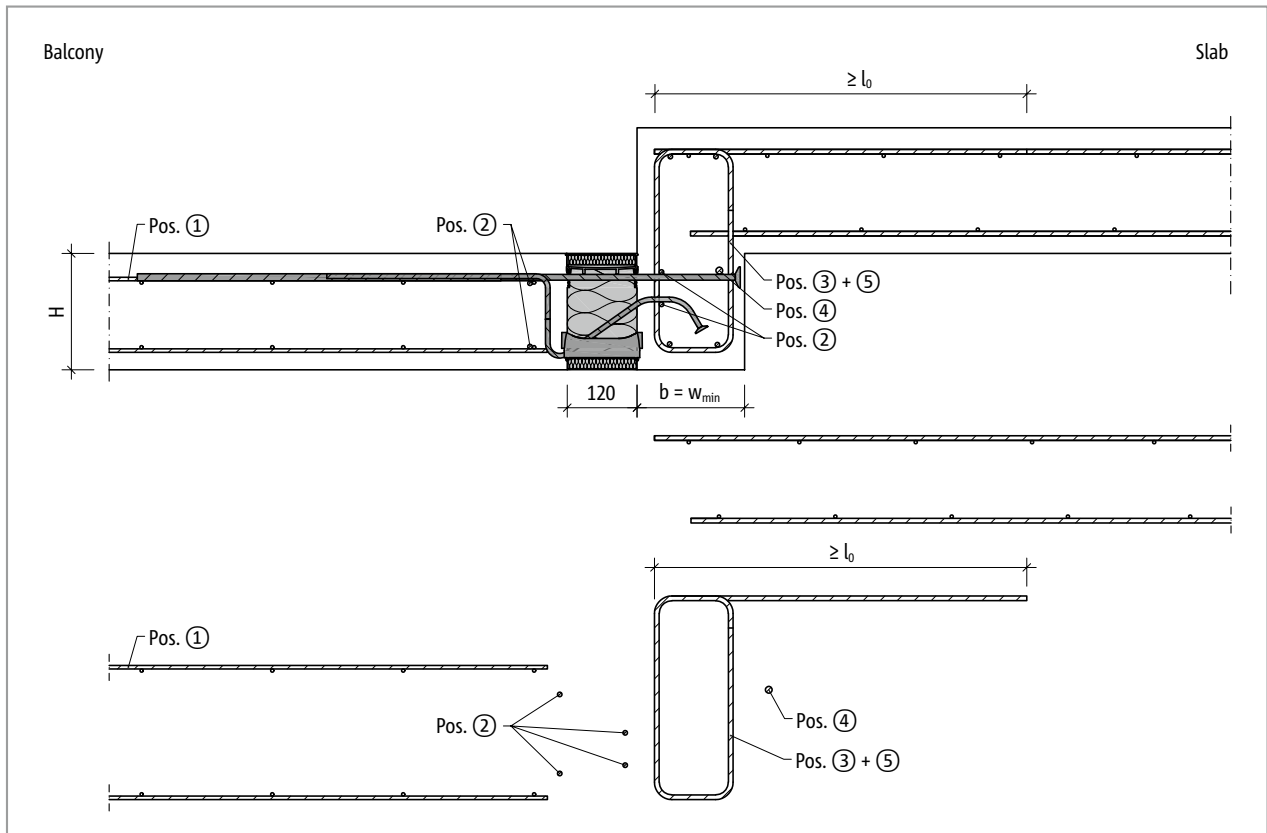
Schöck Isokorb® XT type K-U: On-site reinforcement for balcony with height offset downwards with minimum structural element dimension ( $w_{vorb} = w_{min}$ )
